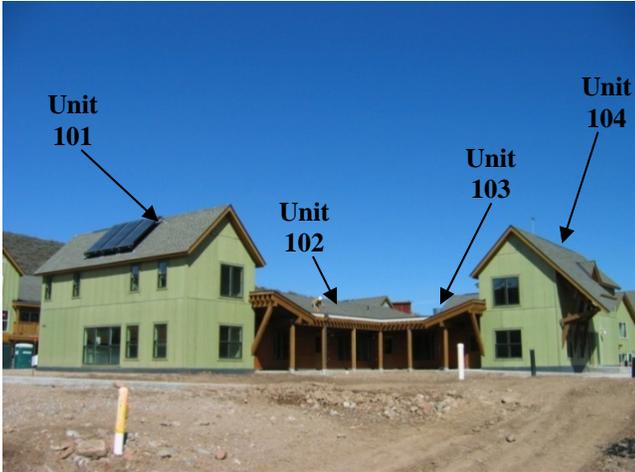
BURLINGAME BUILDING F-1, UNITS 101-104, VIEW FROM SOUTHEAST
